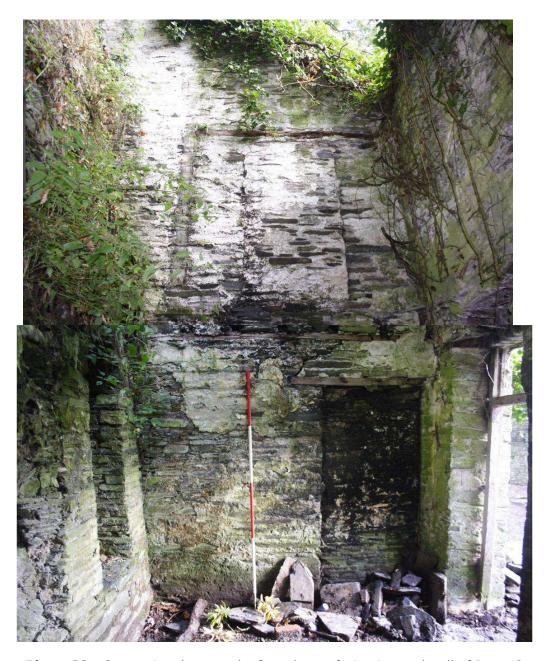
Composite photograph of southwest facing internal wall of Room 2 with blocked doorways to ground and first floor level, 2m scale
